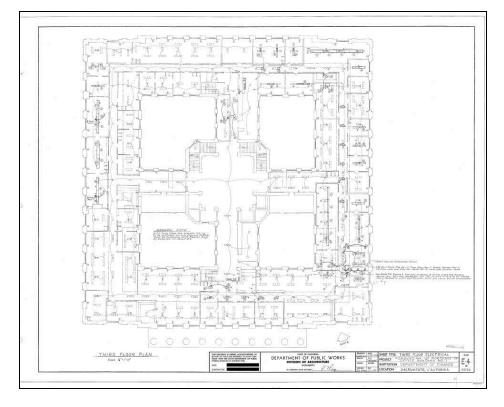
OB 1 Third Floor Plan Renovation. December 30, 1963.
